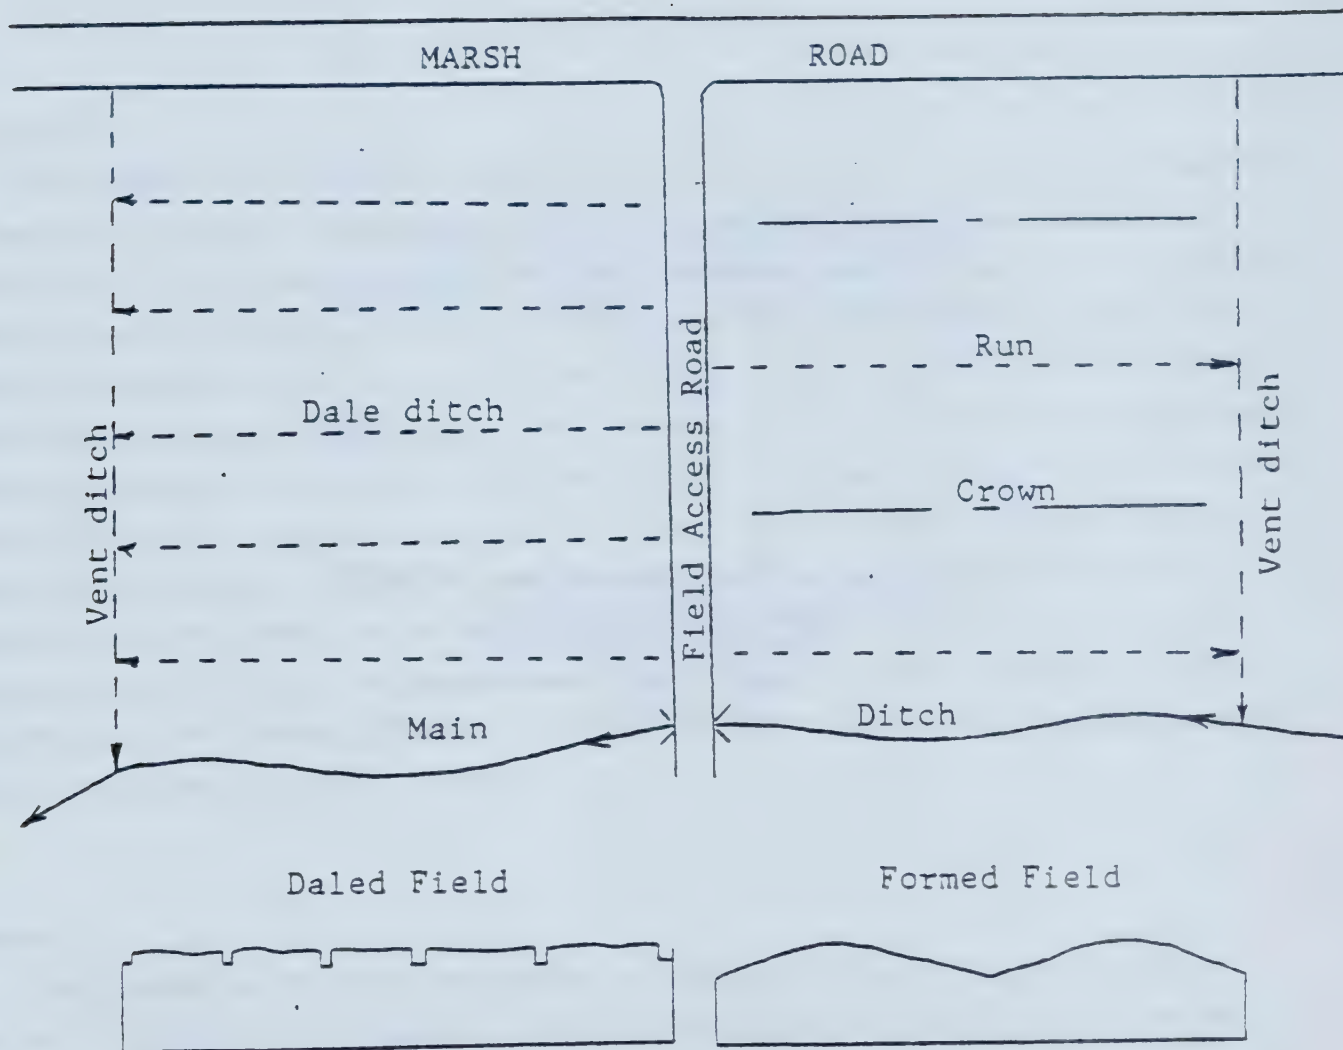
Typical plan view and cross-section of a daled and a formed dykeland field.
